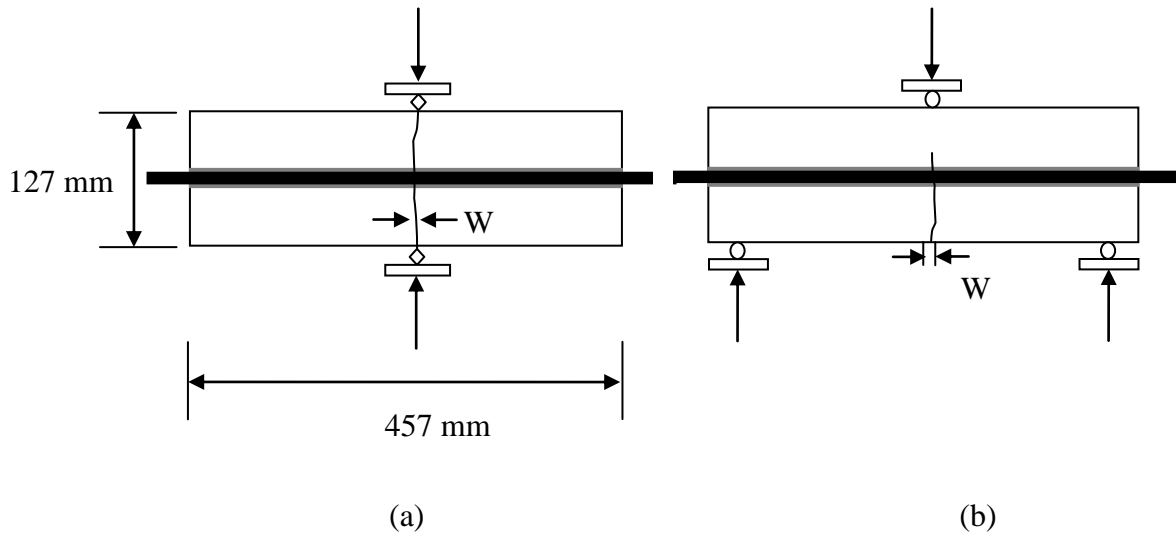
Cracking methods, dimensions, and crack opening measurement location for (a) tensile crack and (b) flexure crack specimens (1 in. = 25.4 mm)
